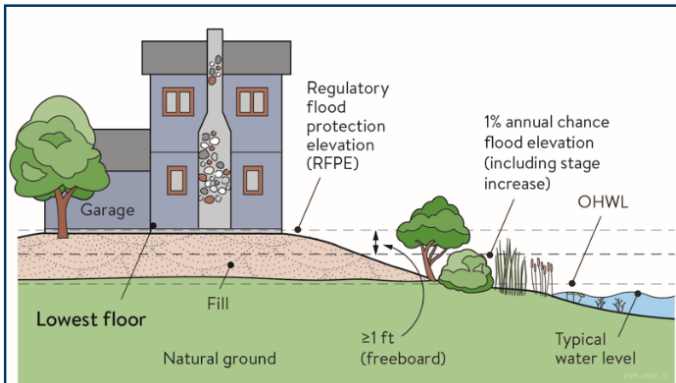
Top of finished first floor surface is lowest floor. A concrete slab on grade is permitted for a new home in the flood fringe if the top of the lowest floor is at or above the RFPE.
